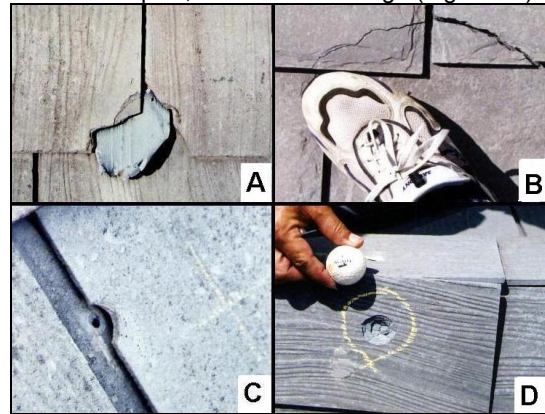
Mechanical damage to wood fiber-cement tiles: a) broken corners and metal toe-board bracket, b) foot broken tiles, c) chipped tile edge and nail hole, and d) golf ball impacts.
